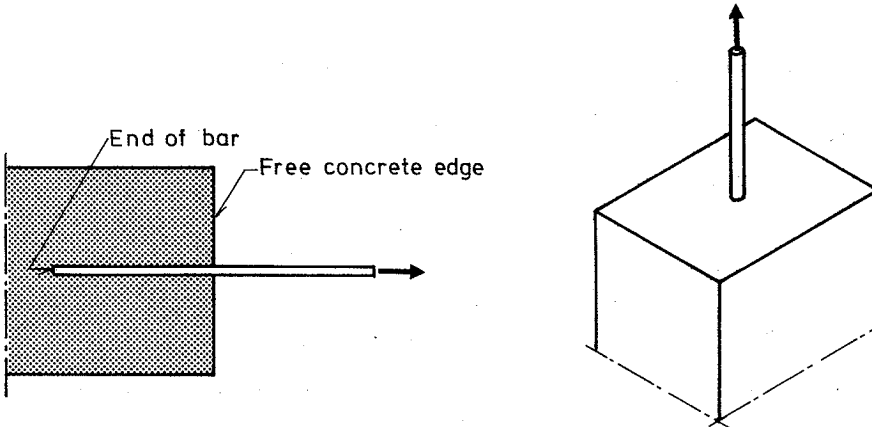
Anchorage of a bar in a concrete specimen with a free edge.
